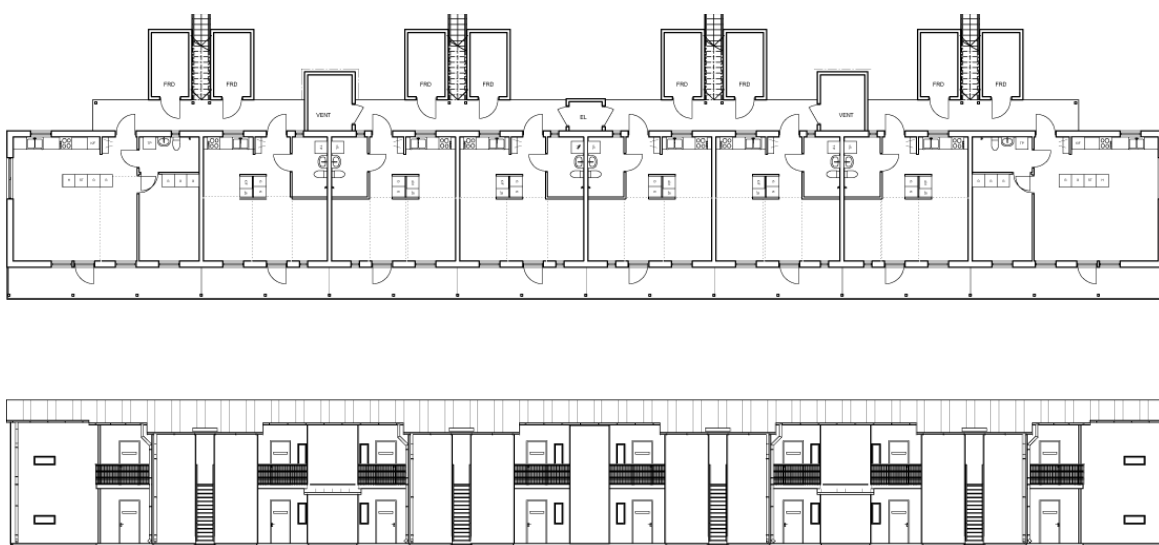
Example H. Plan and façade. With permission from Arcum Arkitektkontor. Uppsala
